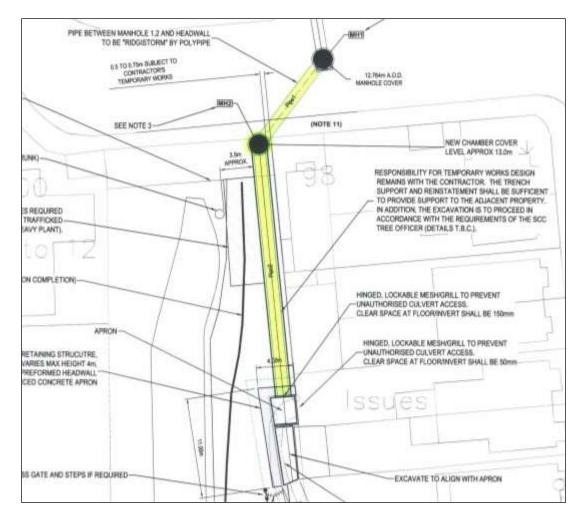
Detail of the plan of the proposed works showing the trenches and manhole still to excavate (yellow)
